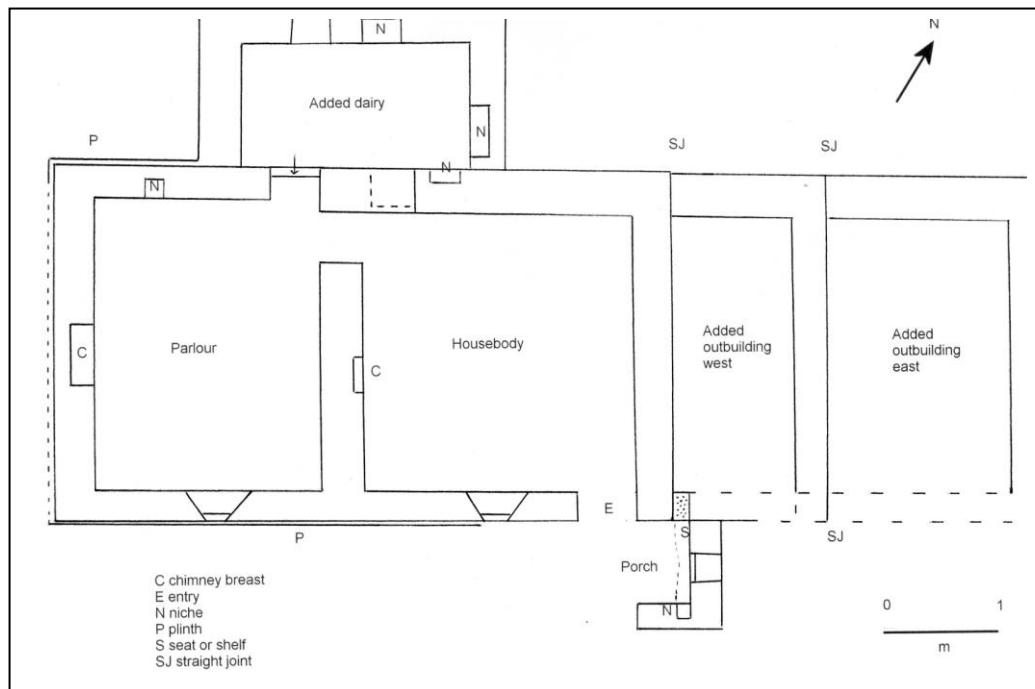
Thorns 1, final scale plan compiled after building works
